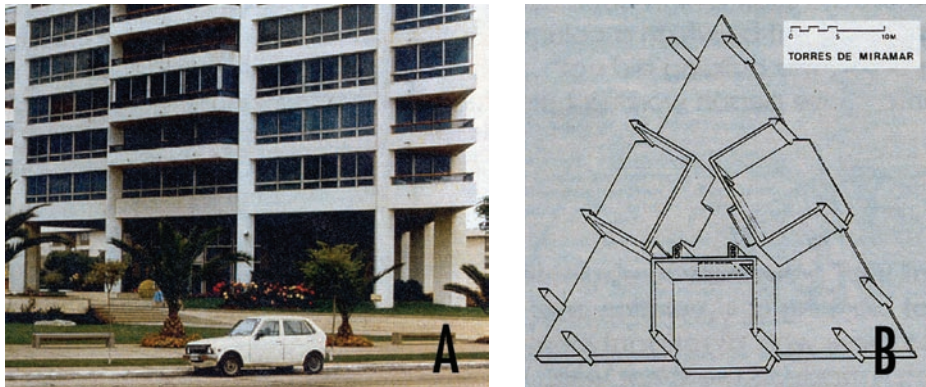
This apartment house appears to have a soft first story (Figure 5-12A), but the lateral force-resisting system is a strong internal shear wall box, in which the shear walls act as party walls between the dwelling units (Figure 5-12B). The architect achieved a light and elegant appearance, and the engineer enjoyed an optimum and economical structure.
